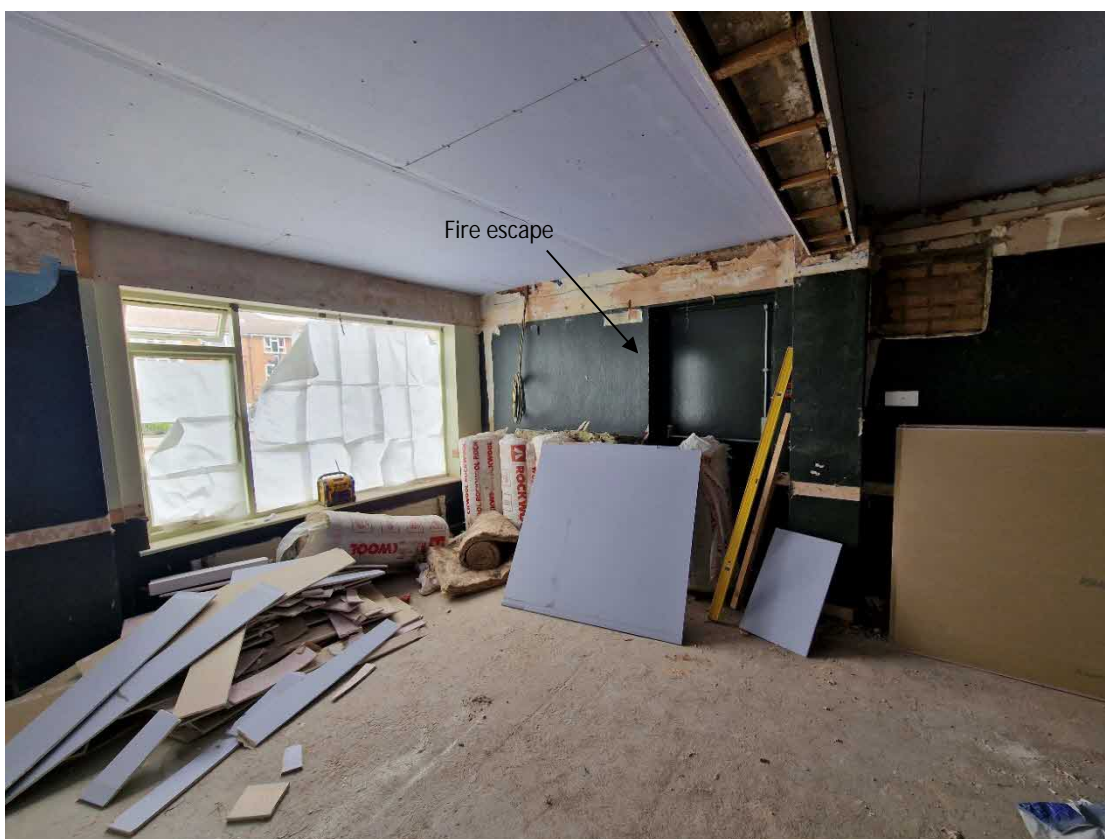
Easternmost window to Atherstone Street and fire escape door to the right (arrow)
